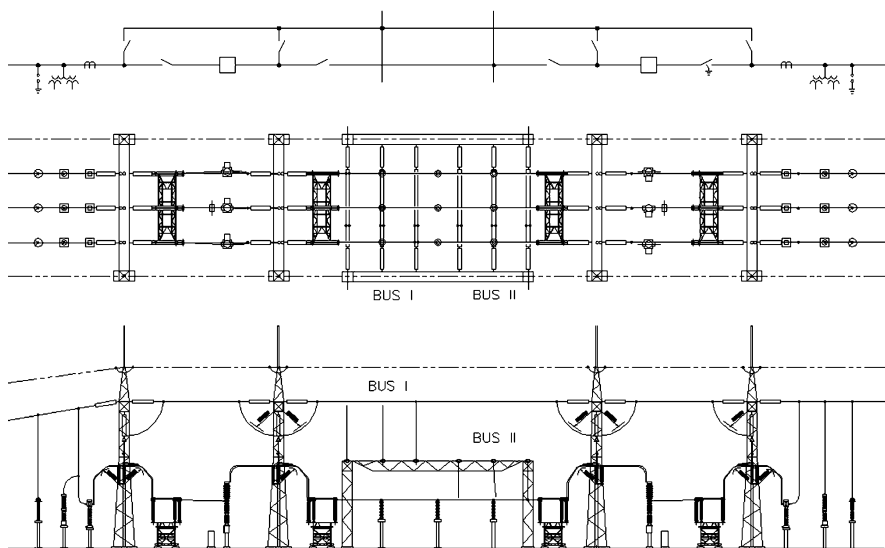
Double busbar with four disconnectors (plan view and elevation)
